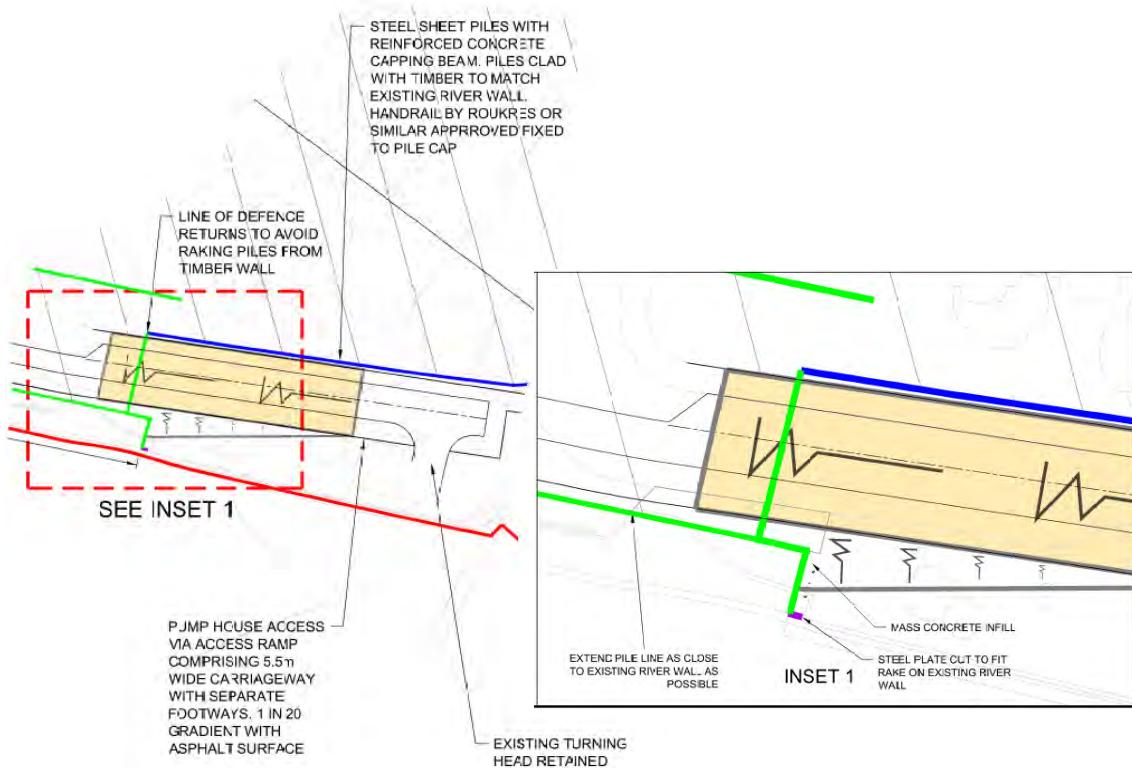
Clip of general arrangement around the Pump House on the Phase 1 site
